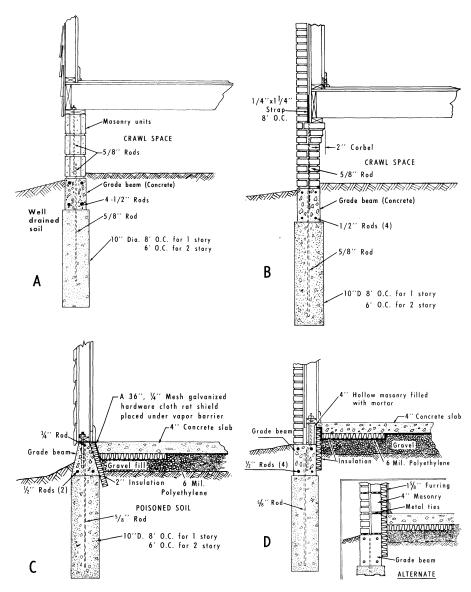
A, Grade beam for a frame house with a crawl space; B, grade beam for a brick-veneer house with a crawl space; C, grade beam for a frame house with a slab floor; D, grade beam for a brick-veneer house with a slab floor.
